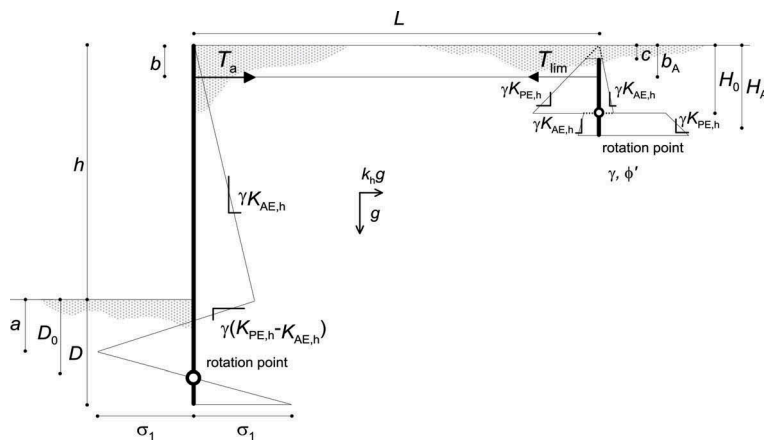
Typical layout of ASSP walls and proposed earth pressures distribution on the retaining wall and on the anchor wall.
